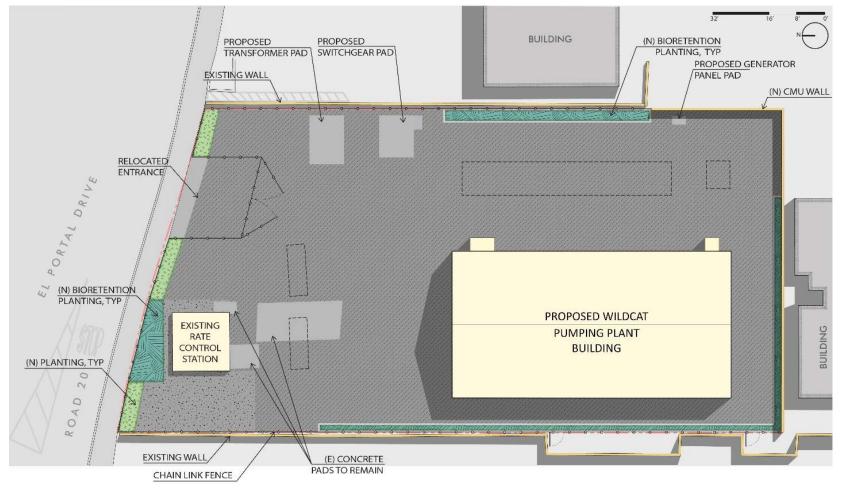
Wildcat Pumping Plant Site and Road 20 Storm Drain Pipeline Alignment
